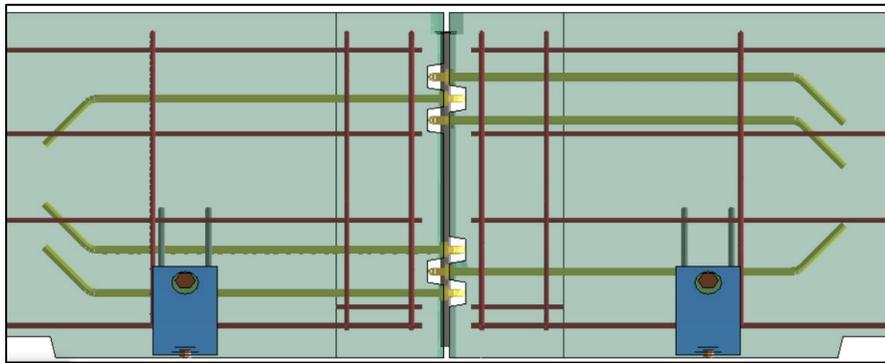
Reinforcement Details of Modified Barrier Model.
